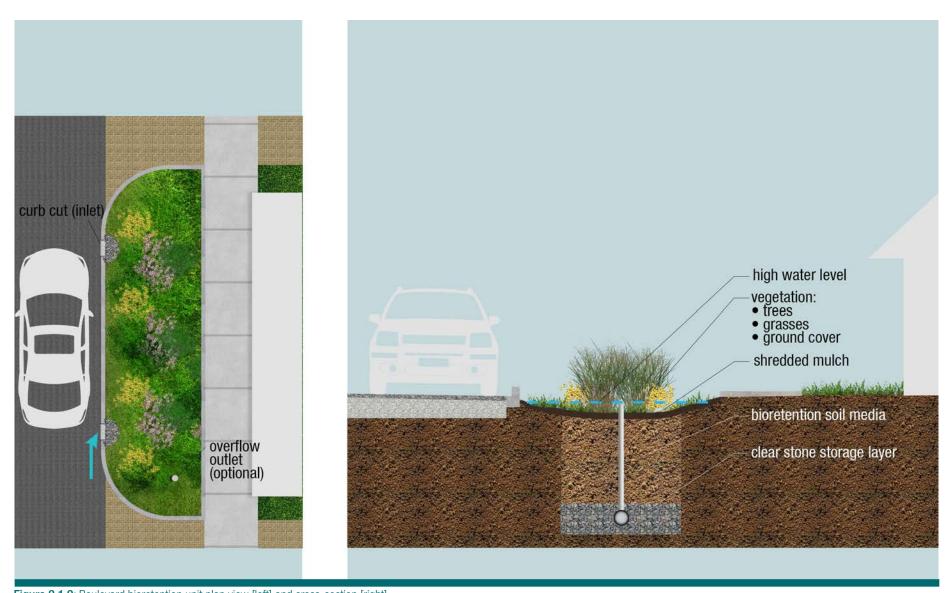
Boulevard bioretention unit plan view [left] and cross-section [right]
